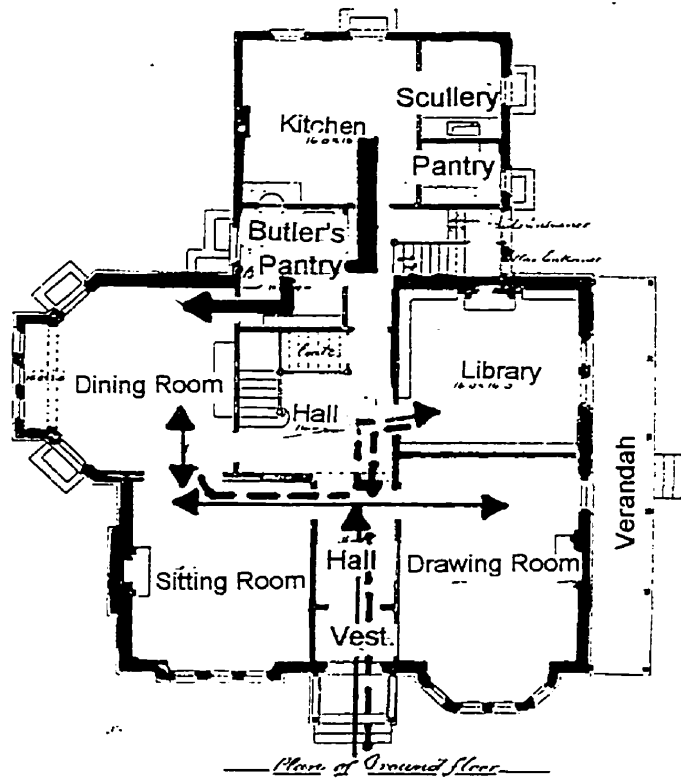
69 Herkimer. Ground Floor. Architectural Plans, March 15, 1880
